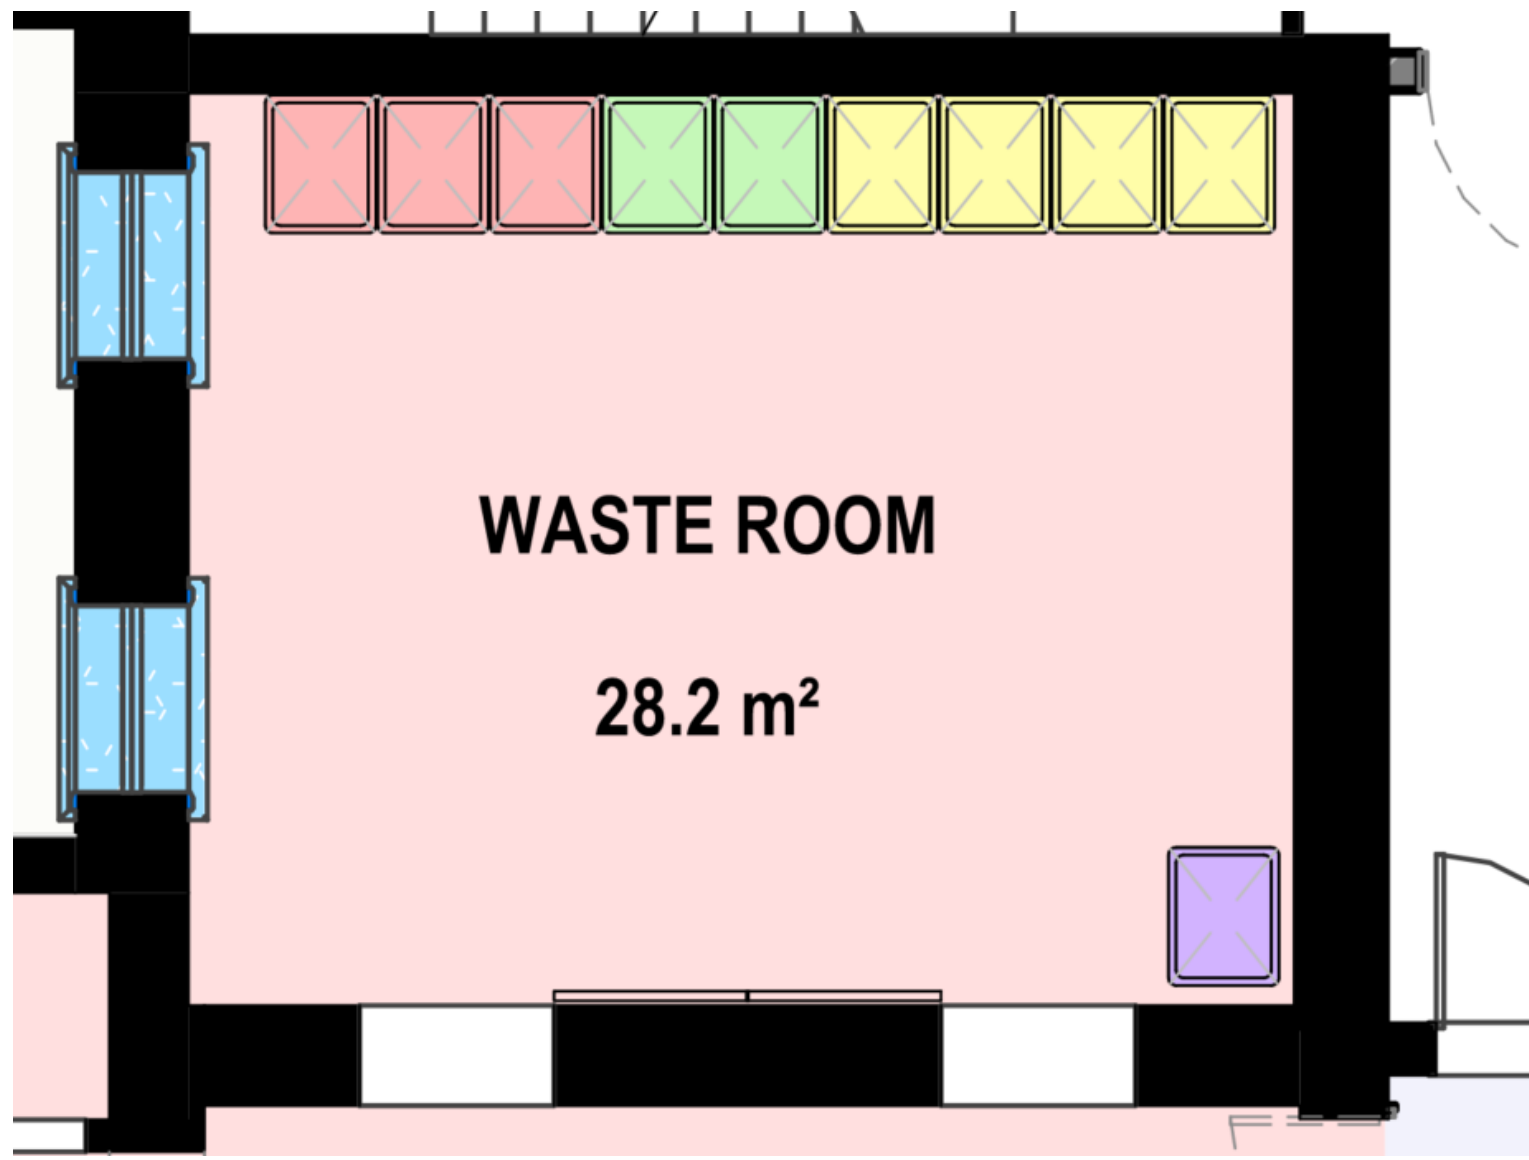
Bin Room Layout - Building B (Eastern Townhouses)
